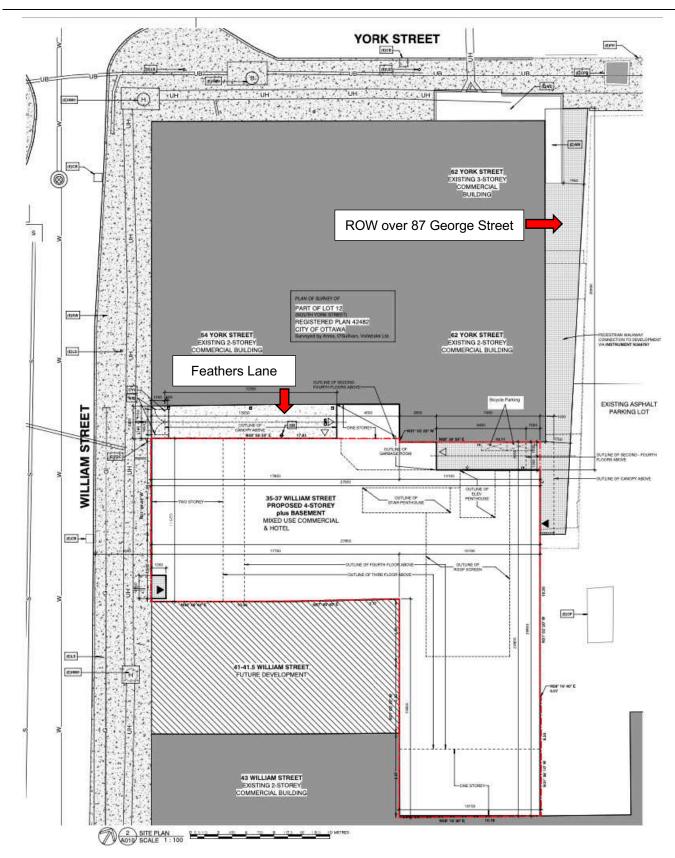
Exhibit L: Site Plan of the Proposed Redevelopment (cropped).
